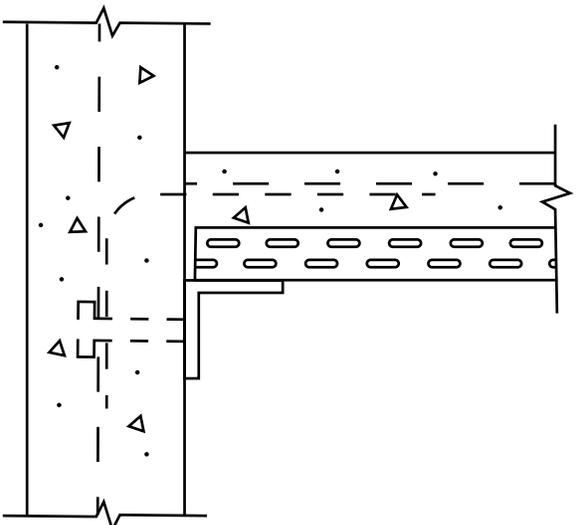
CONCRETE OR CMU WALL LEGER DECK PERPENDICULAR
